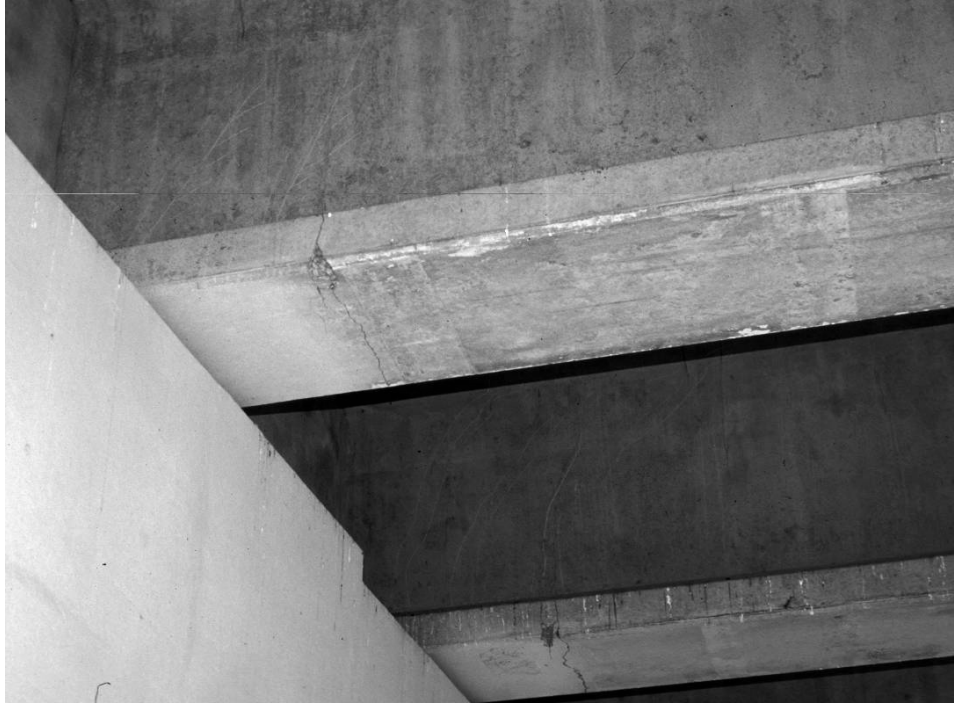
Cracked Pretensioned Bulb-Tee Girders (Barnes et al. 2006)
